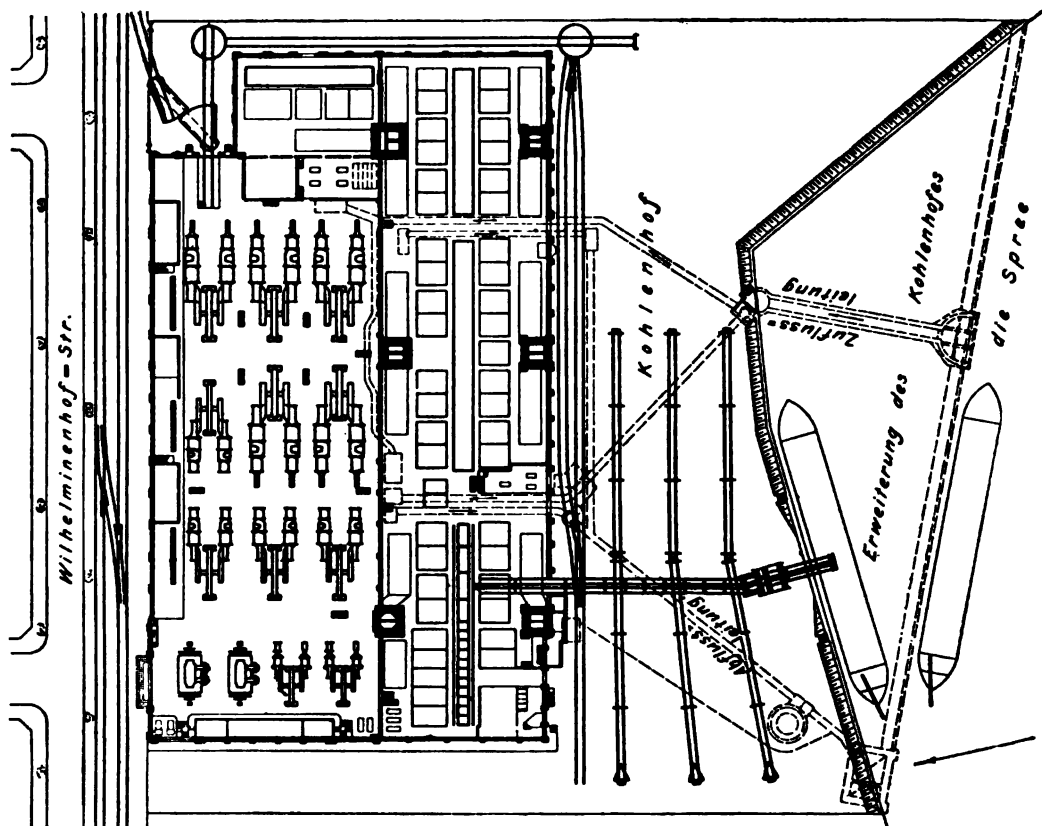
Plan of "Oberspree" Plant, Berlin. Coal Handling System and Storage at Right Hand (*Zeitschrift des Vereines deutscher Ingenieure*).
